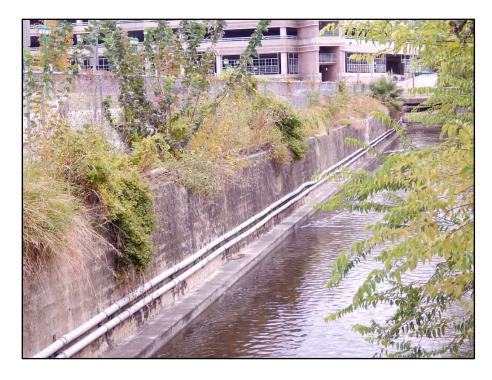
Narrow concrete conduit-bank running along east wall.
